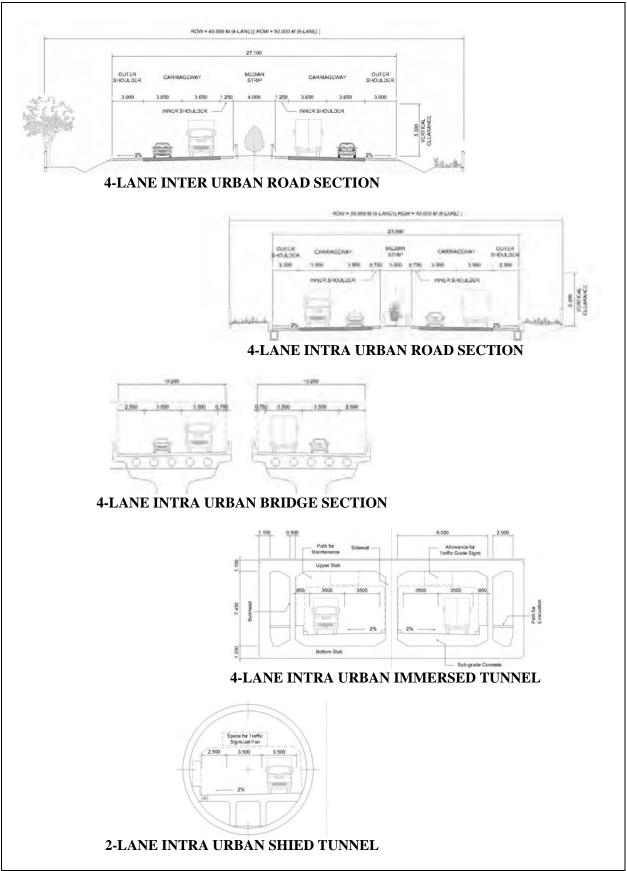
TYPICAL CROSS SECTION OF HSH-1
